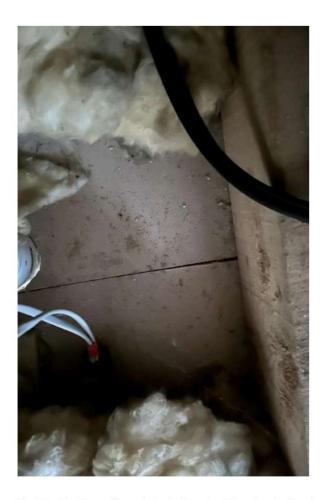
, 40: The ceiling of the hall to the 90s wing is clearly modern with use of modern timber, chipboard, insulation and plasterboard.
